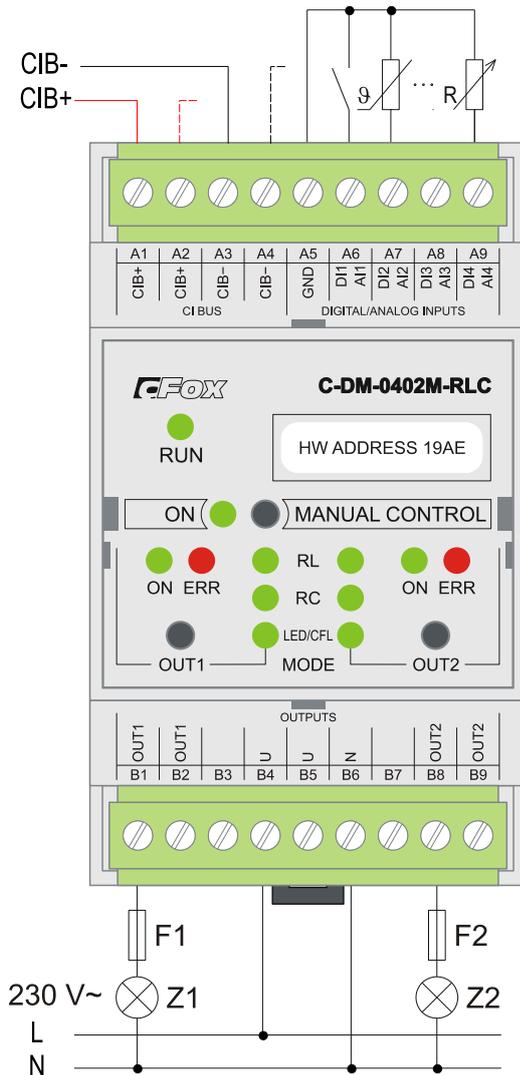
25 View and connecting C-DM-0402M-RLC
